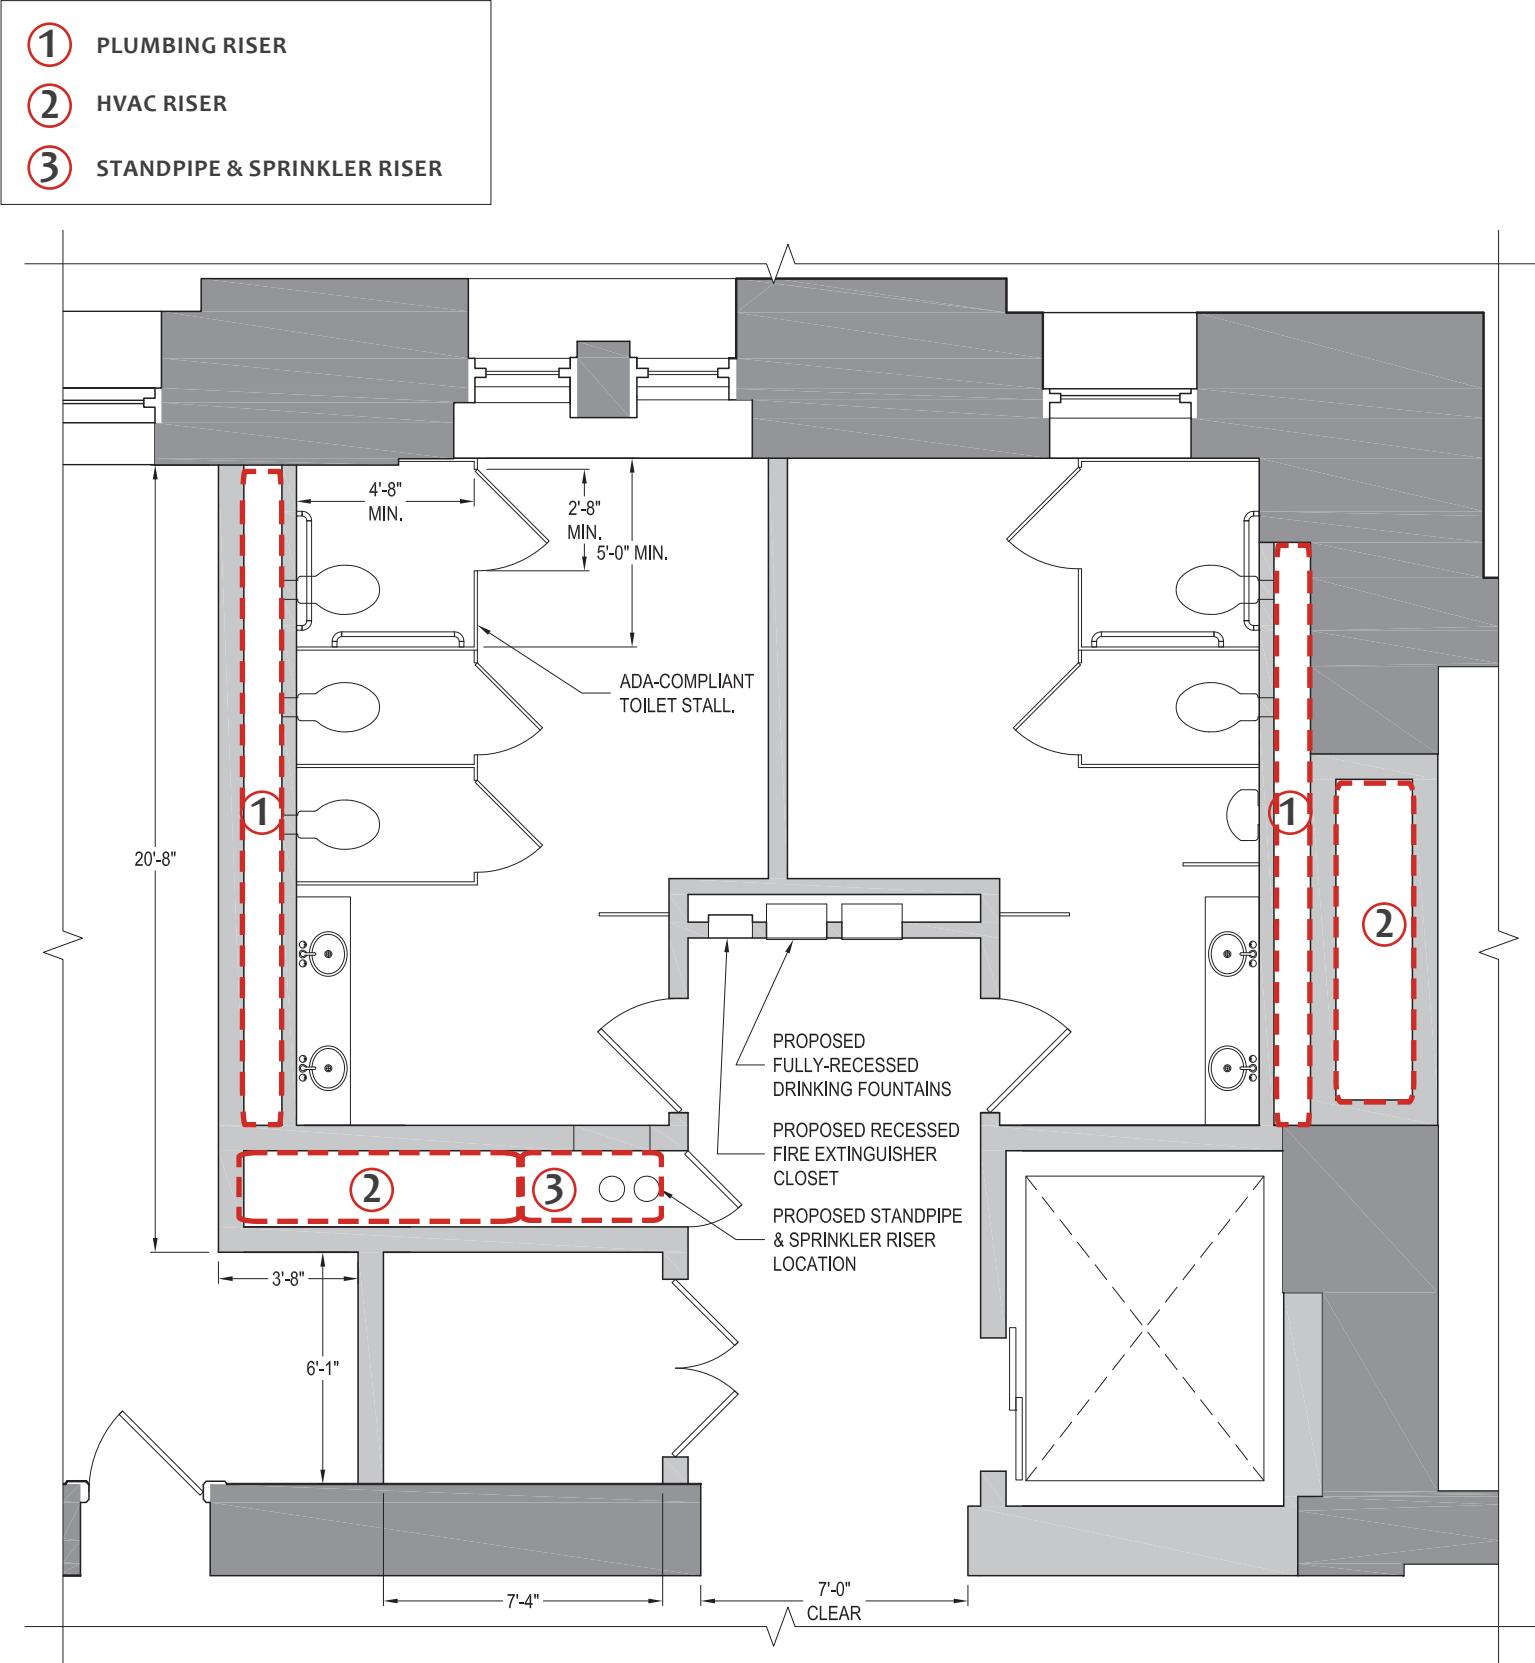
Basement Floor Level [West] Proposed Service Core.
